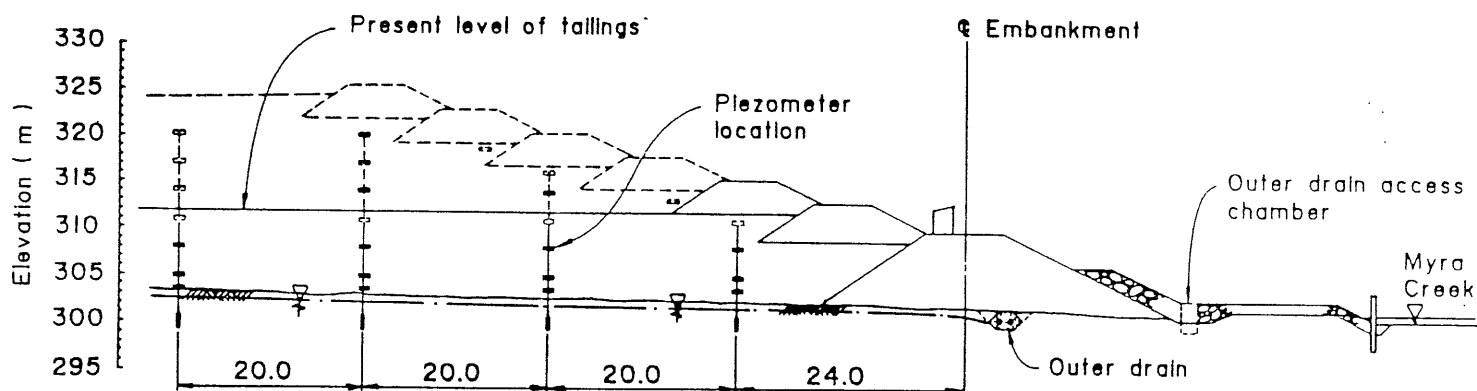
Schematic Cross-Section of Embankment Showing Piezometer Installations.
